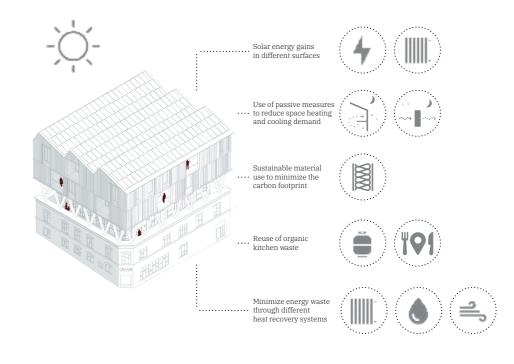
1. Concept of the RoofKIT whole building approach with its main innovations
